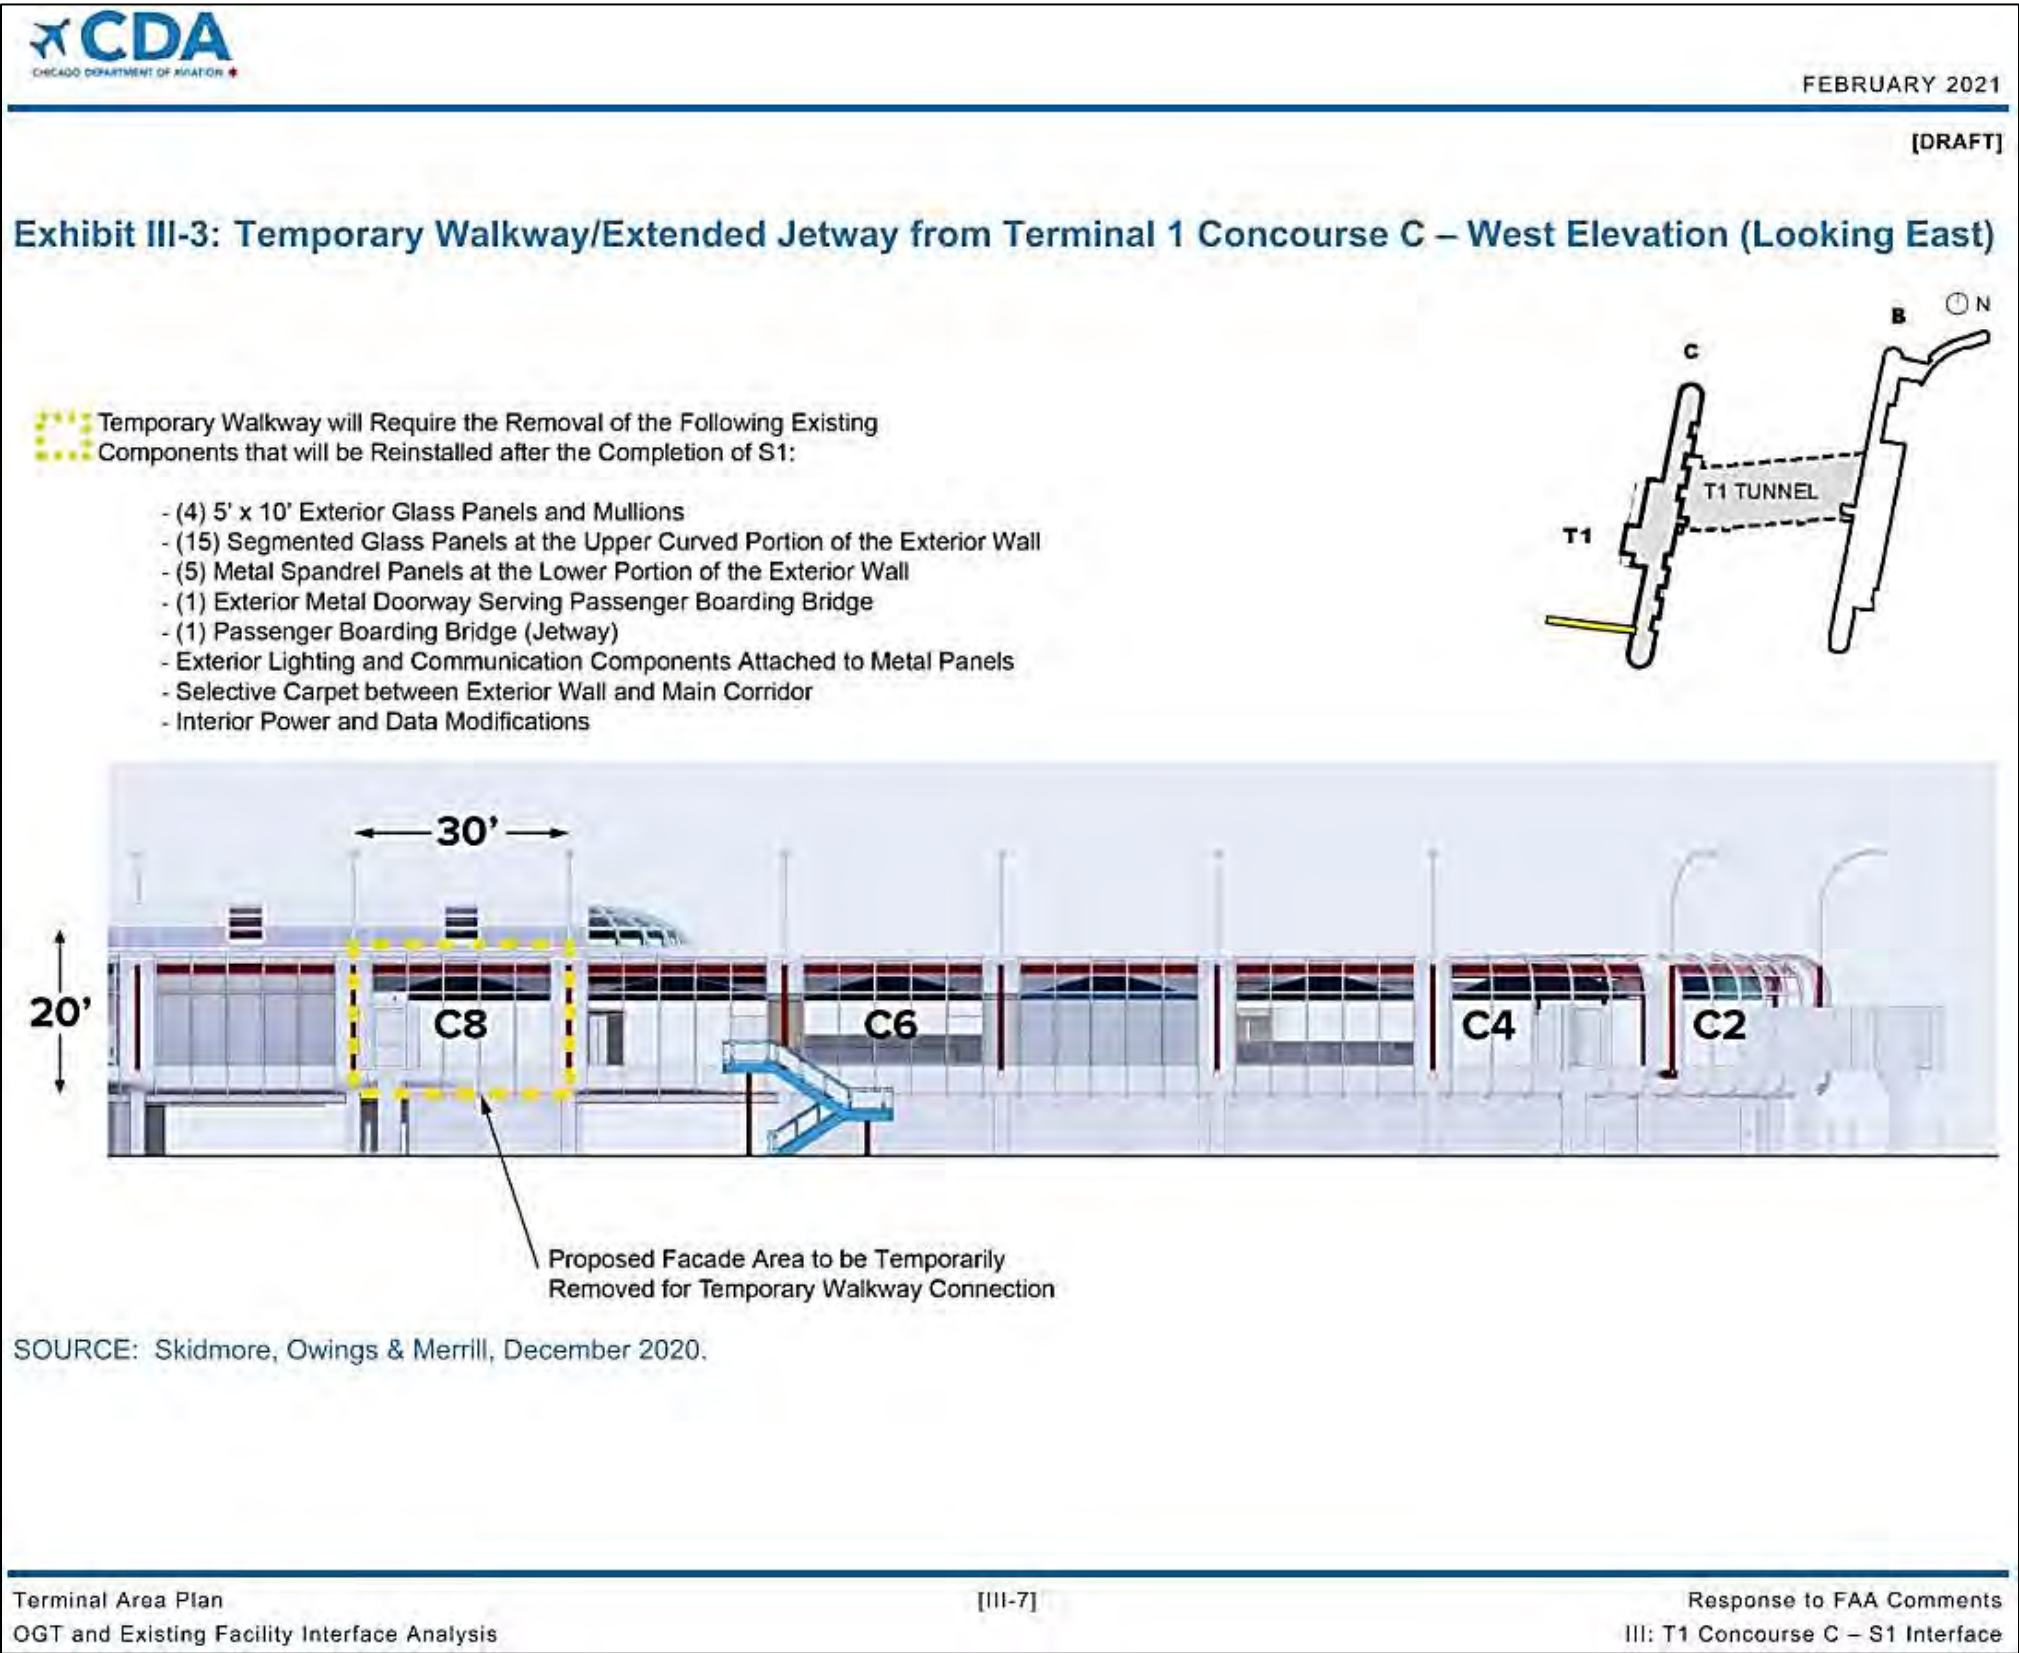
Exhibit III-3: Temporary Walkway/Extended Jetway from Terminal 1 Concourse C – West Elevation (Looking East).
